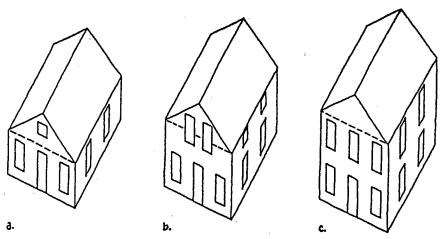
Wall height guidelines illustrated, note the eave line: a) one story, b) one-and-one-half story, c) two story (after Murphy).
